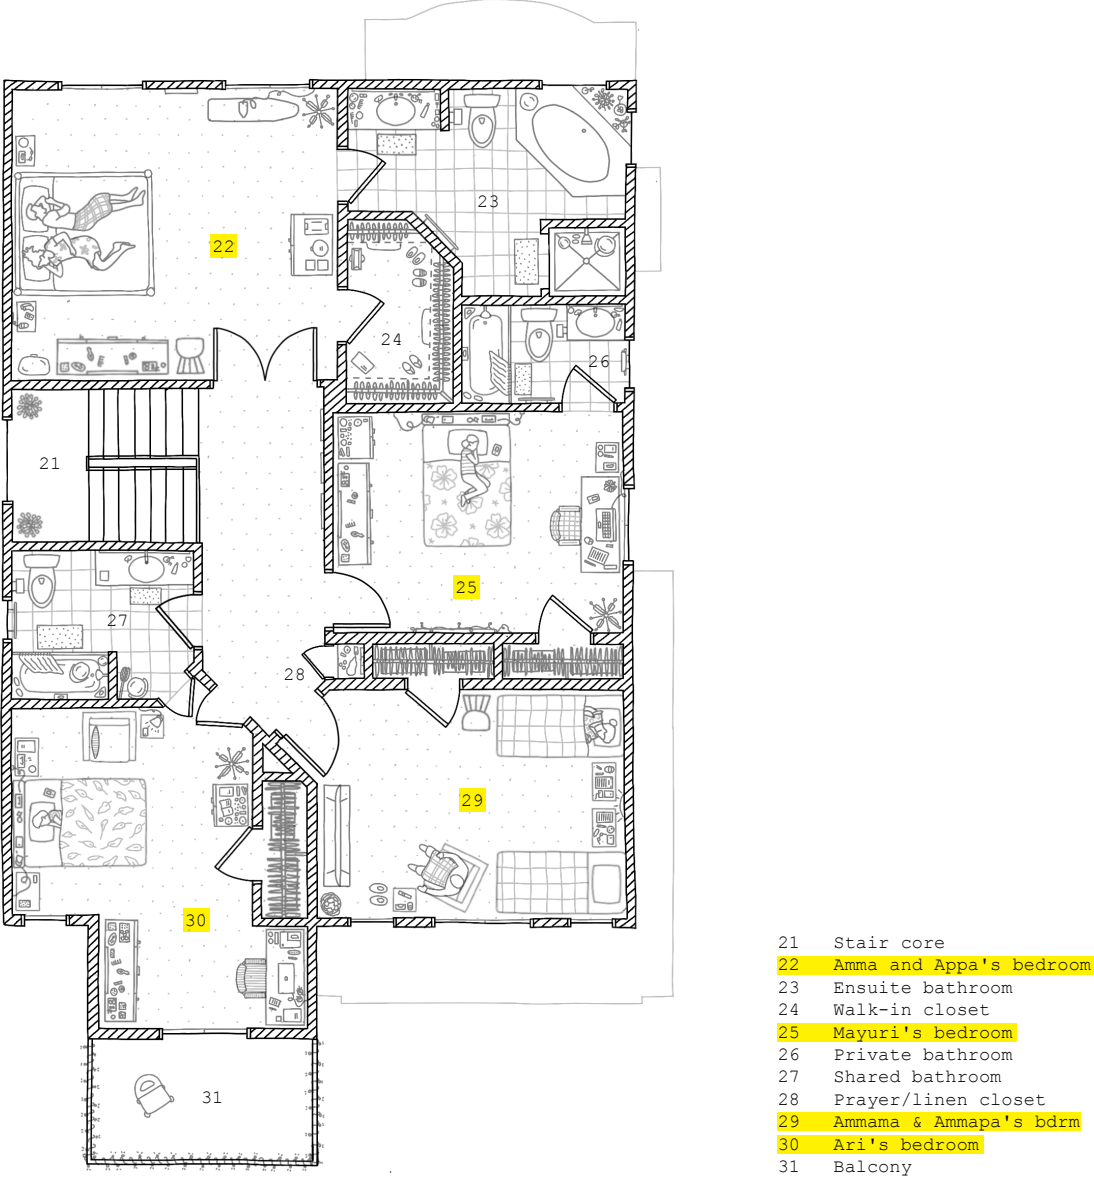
Upper floor plan of the Milton house highlighting how bedrooms were occupied from 2001-2019.
